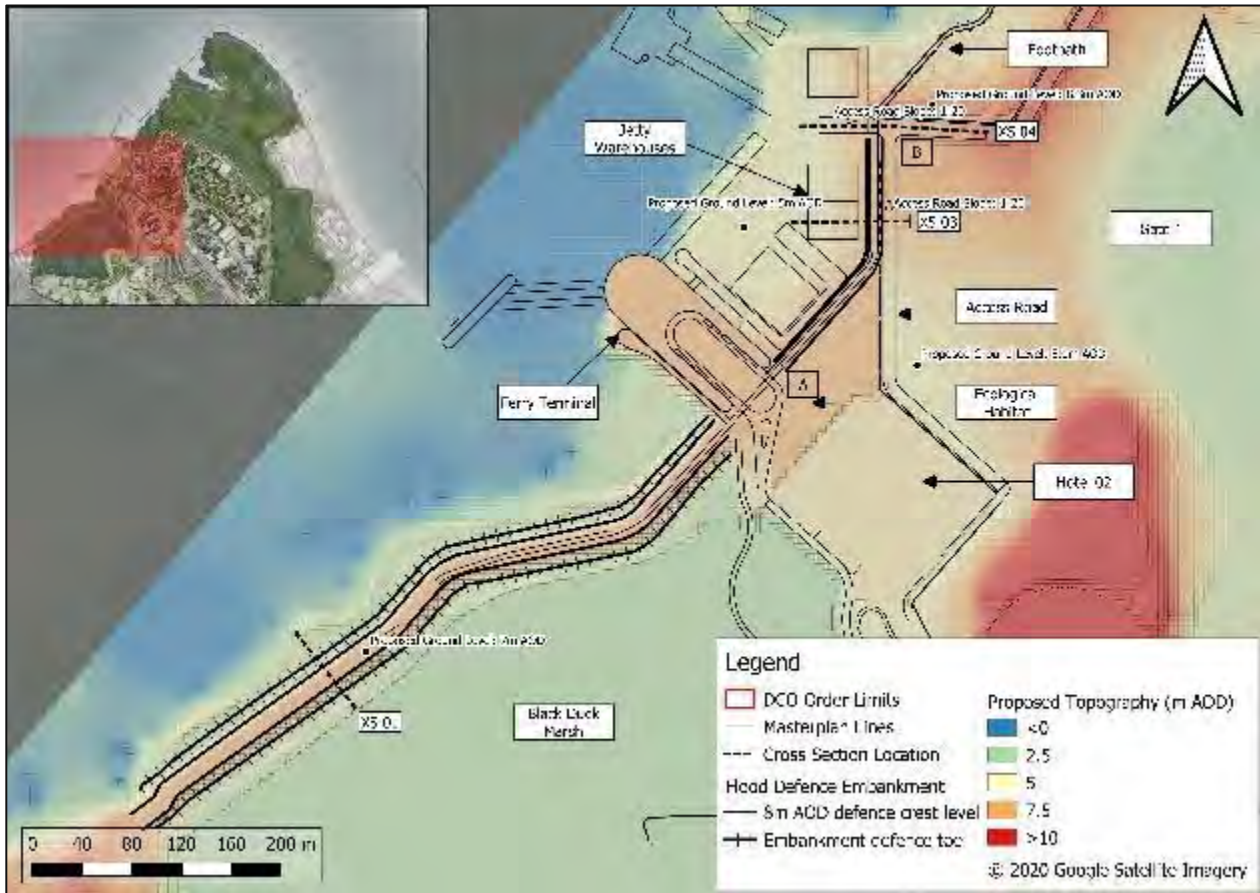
11: Spatial plan of showing indicative location of proposed flood defence crest, toe and raised land levels against proposed topography. This is to achieve recommended TE2100 Plan flood defence SoP to 2125. At location A and B access roads that cross the embankment to access the Ferry Terminal and Whites Jetty respectively will be appropriately ramped up to meet the required crest level whilst maintaining the appropriate gradients.
